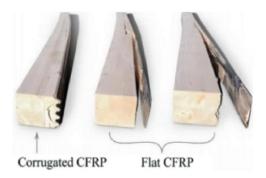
Failure modes observed in corrugated and flat beams reinforced by FRP sheets [46]
